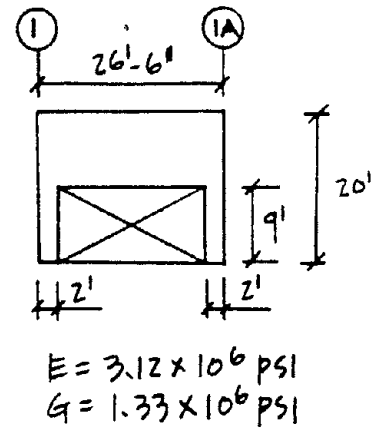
Sample Calculations for Wall Panel Stiffness, 120 Mast Street Building
